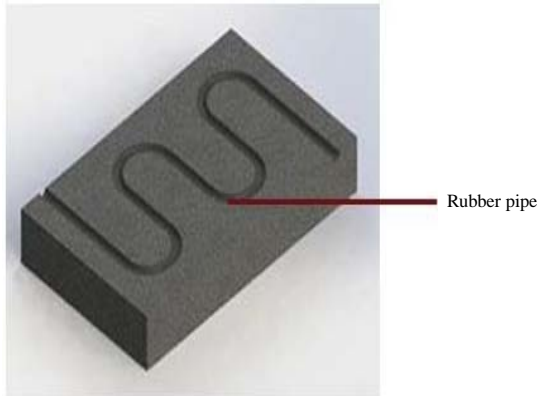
Serpentine rubber pipe embedded in asphalt pavement
